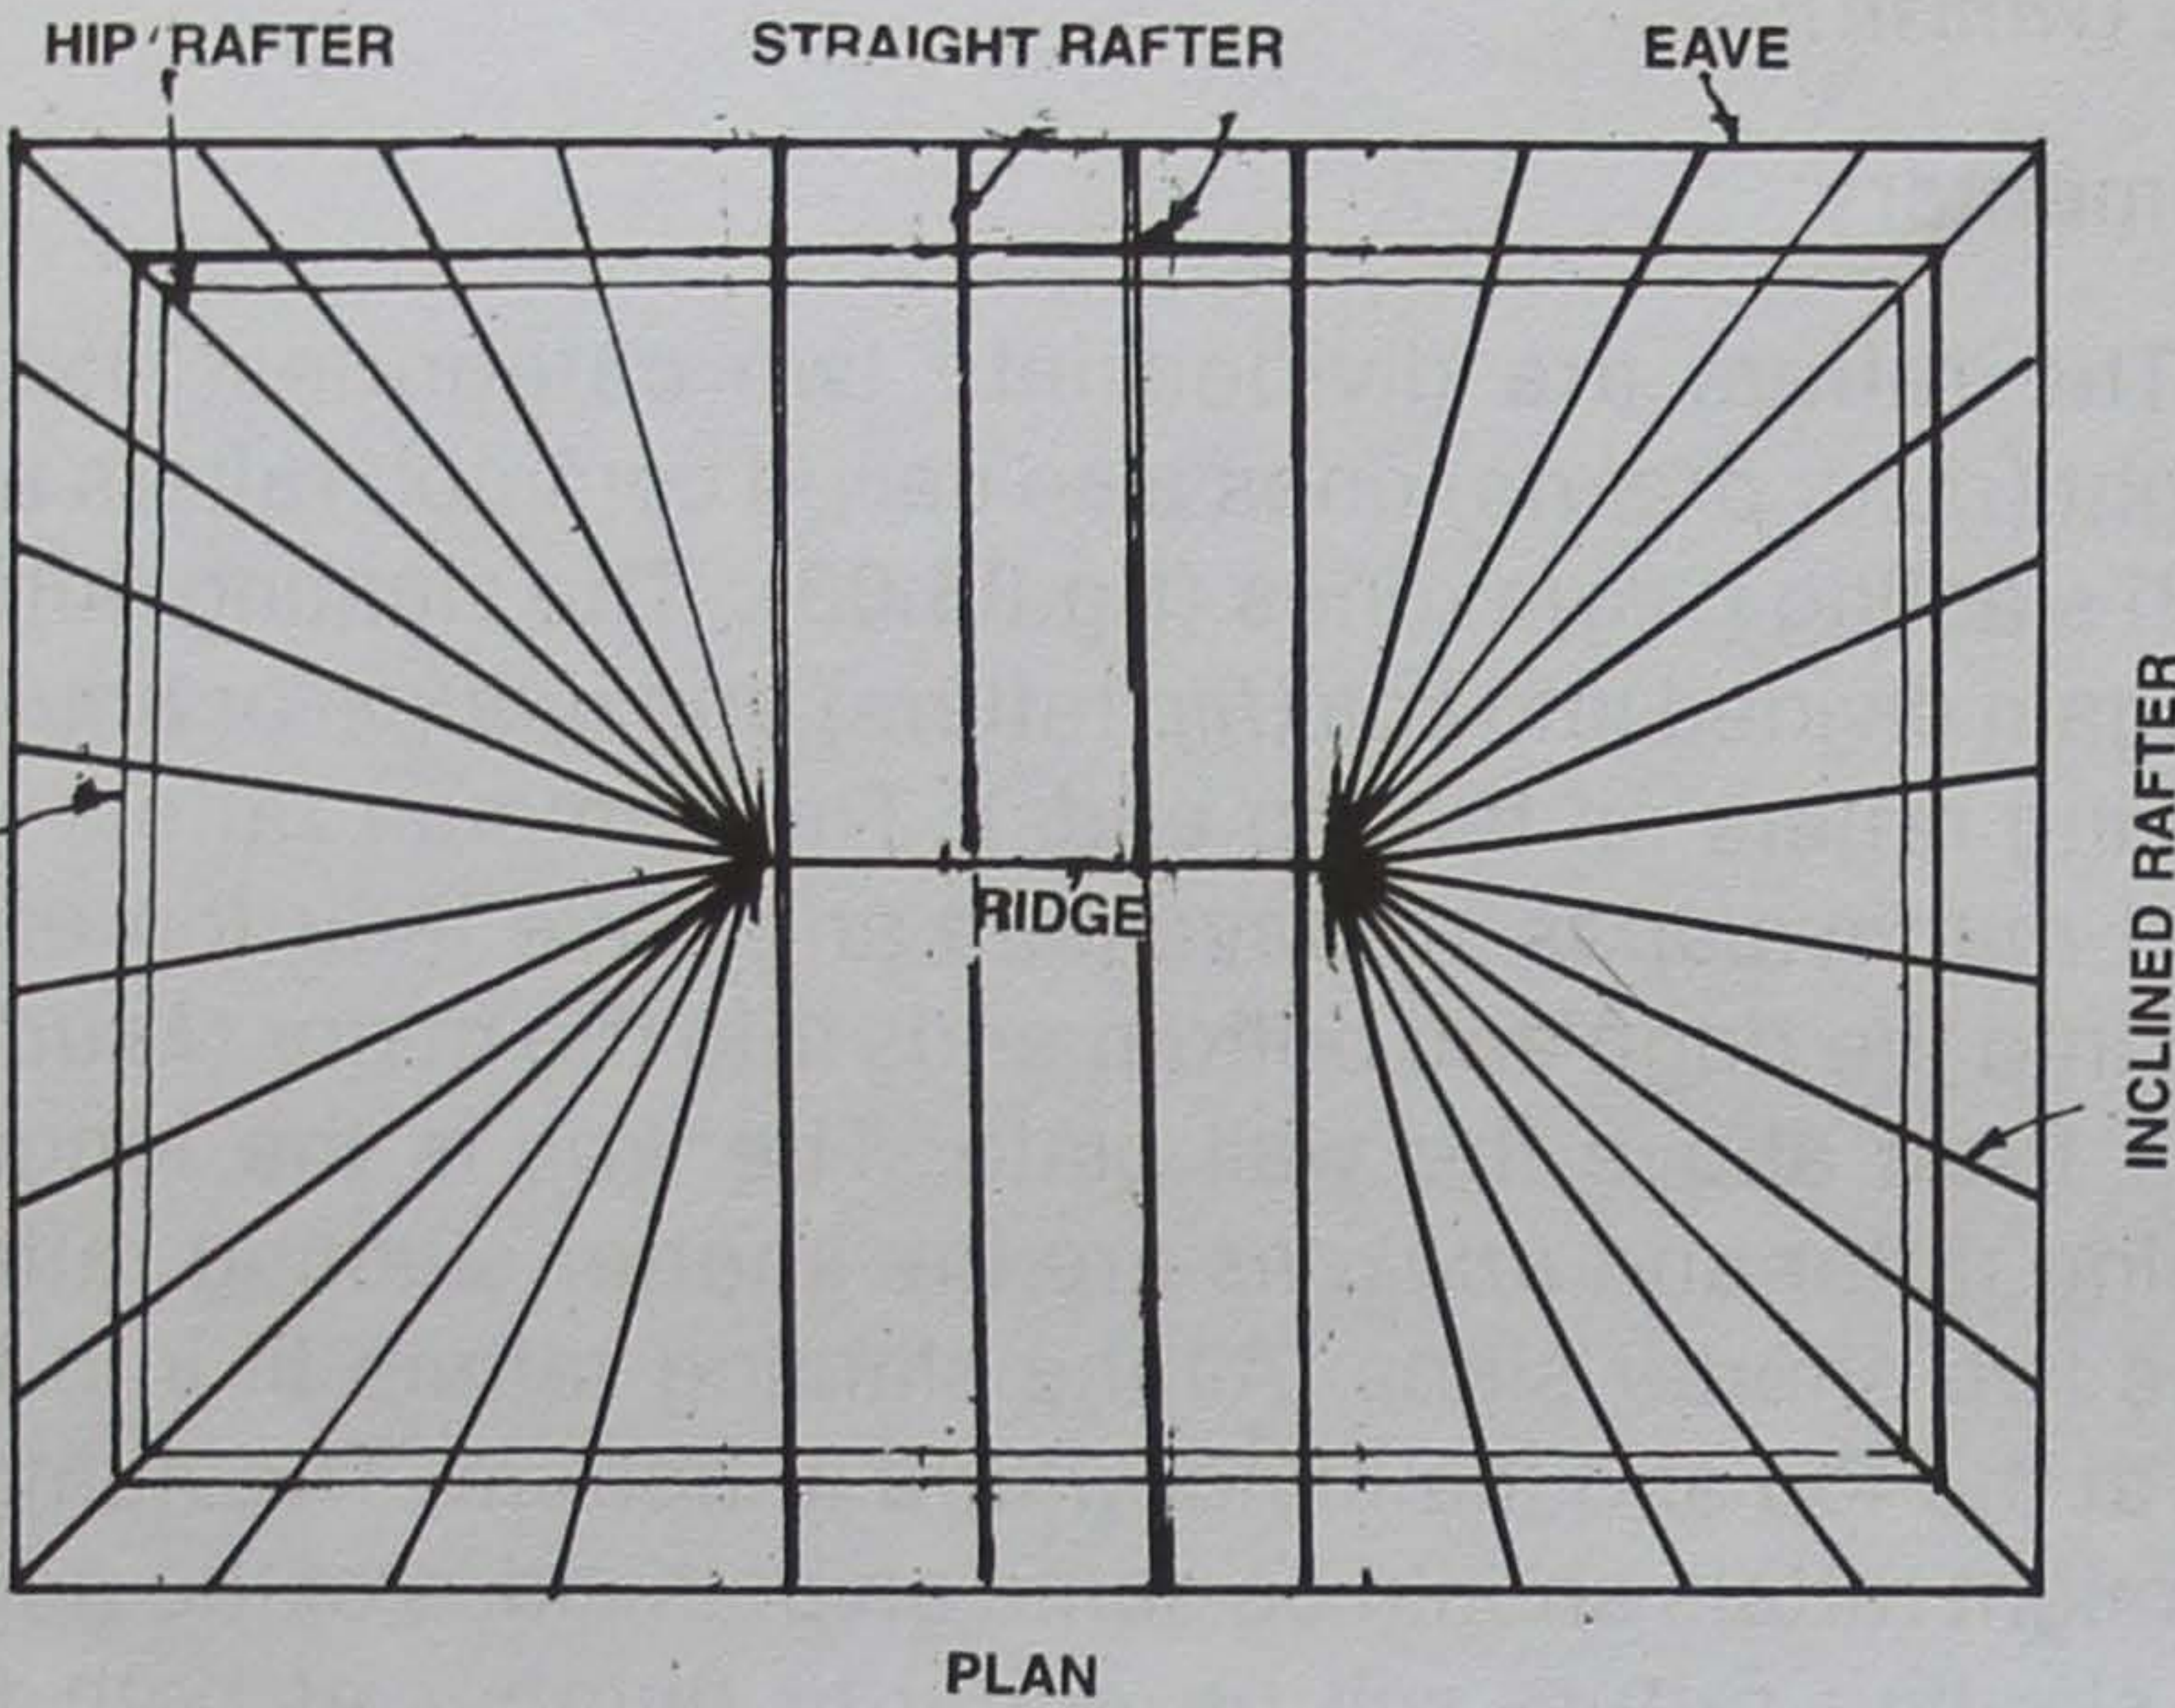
ROOF SHOWING STRAIGHT & INCLINED RAFTERS
